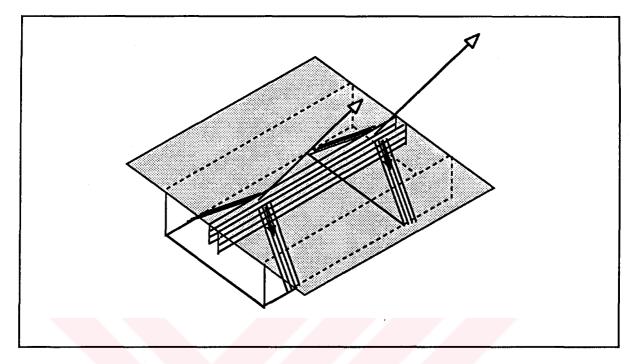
CONNECTION BETWEEN MONO-STRAND STAY CABLES AND A WIDE MONO-CELLULAR STIFFENING GIRDER
